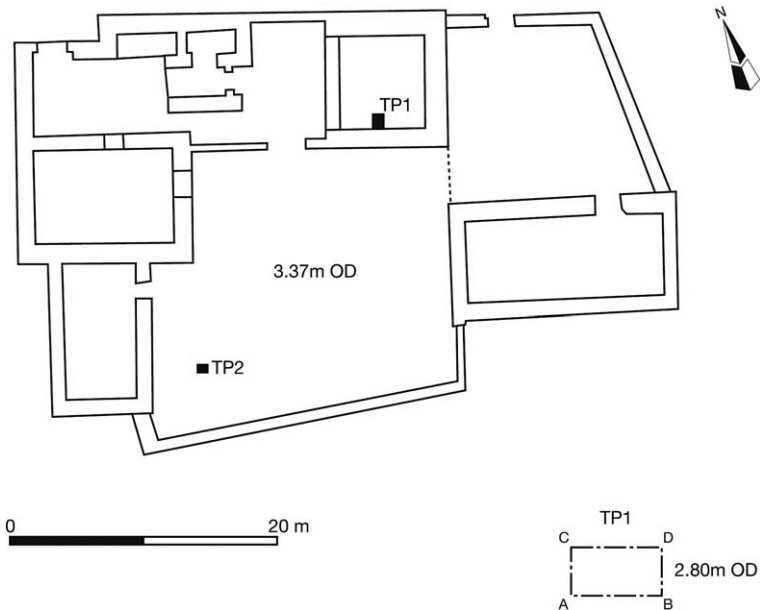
Suakin: location of the two test pits and main trench excavated (SE of House, in bottom right of figure) over three seasons from 2004 to 2007.
